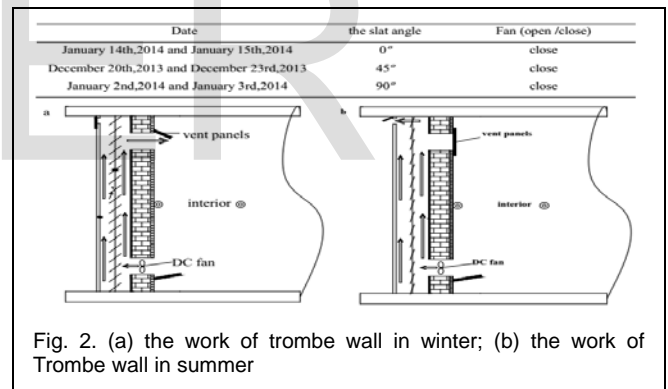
(a) the work of trombe wall in winter; (b) the work of Trombe wall in summer
